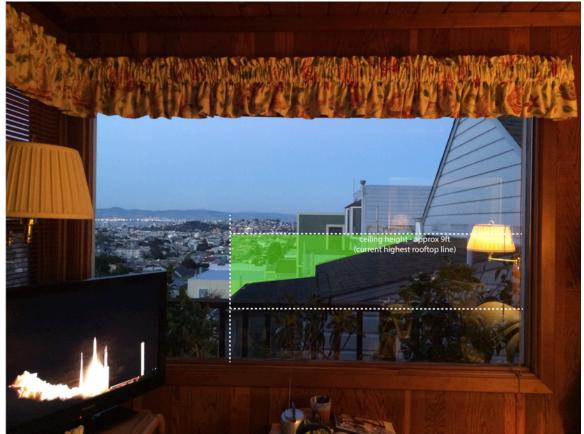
Proposed ceiling height does not block DR requester's upper sitting window
